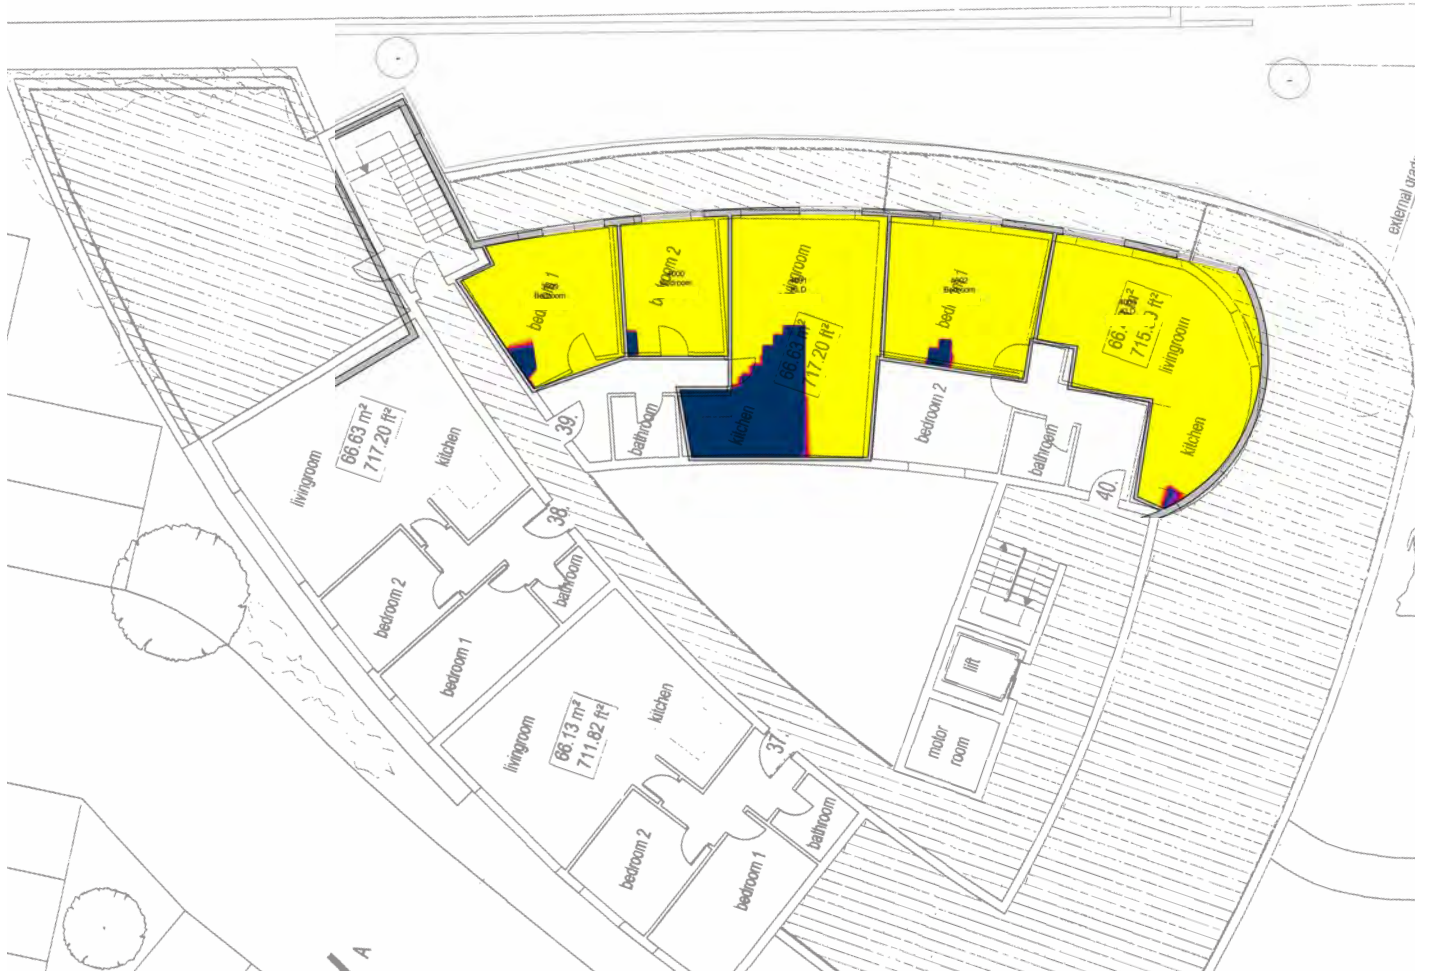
Rotunda court - Top Floor - DD levels with the proposed configuration in place
